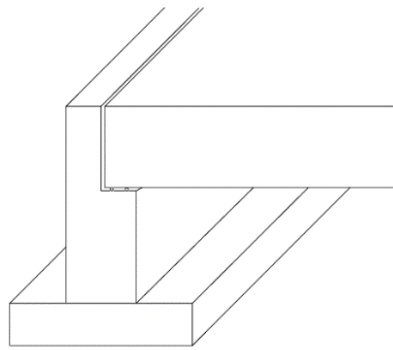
Spread Footing with Cantilever Stemwall at Bridge Abutment
